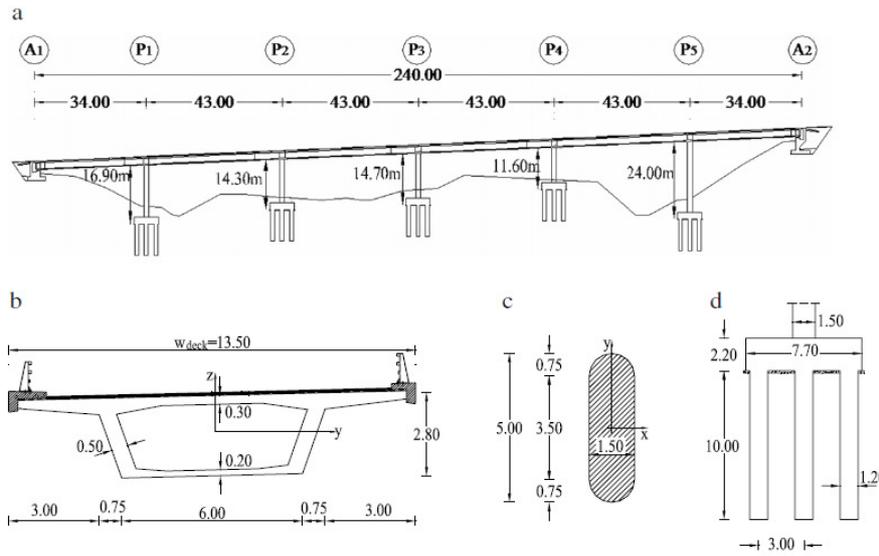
(a) Longitudinal section of the integral “reference” bridge (b) Deck Cross-section (c) Pier Cross-section (d) Foundation
